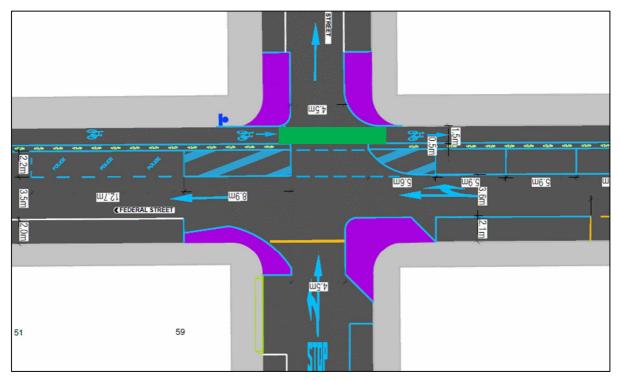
Side road treatment proposed on Federal Street contra-flow route (with suggested improvements)
